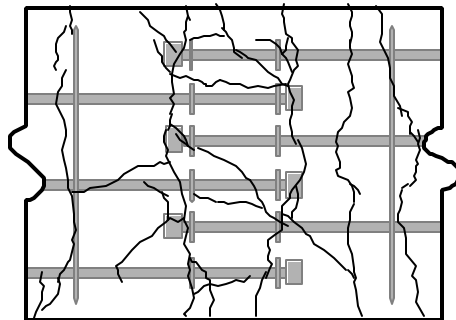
Crack development in the transverse stirrup cage test (specimen LS-08-04.04-12-10(N)-1-TTD) (continued)
